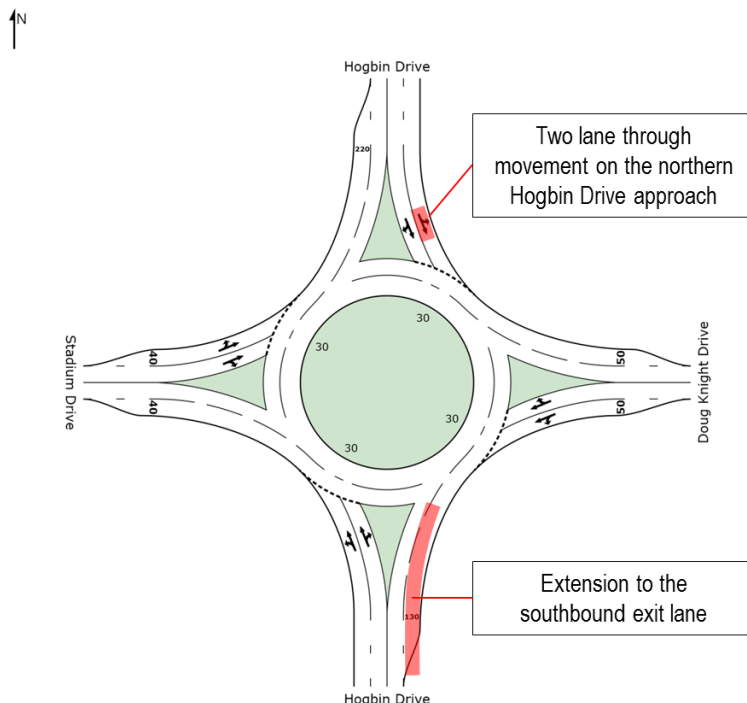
Site 2: Hogbin Drive / Stadium Drive / Doug Knight Drive Upgraded Layout
